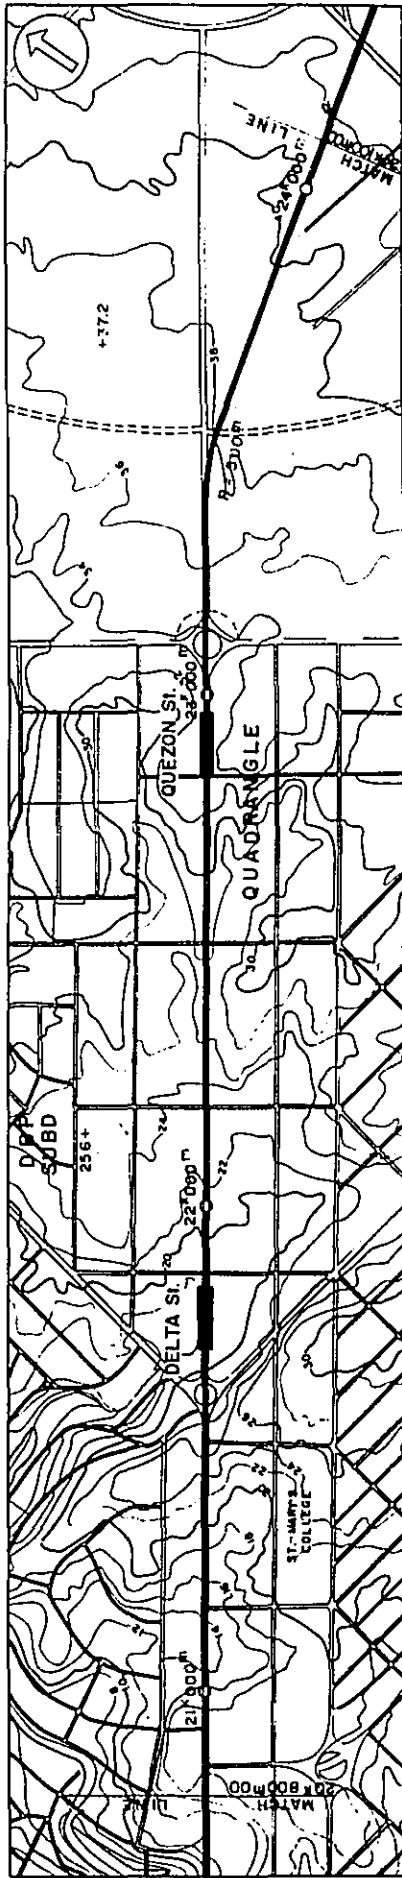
Plan and Profile of Recommended Alternative (7)
